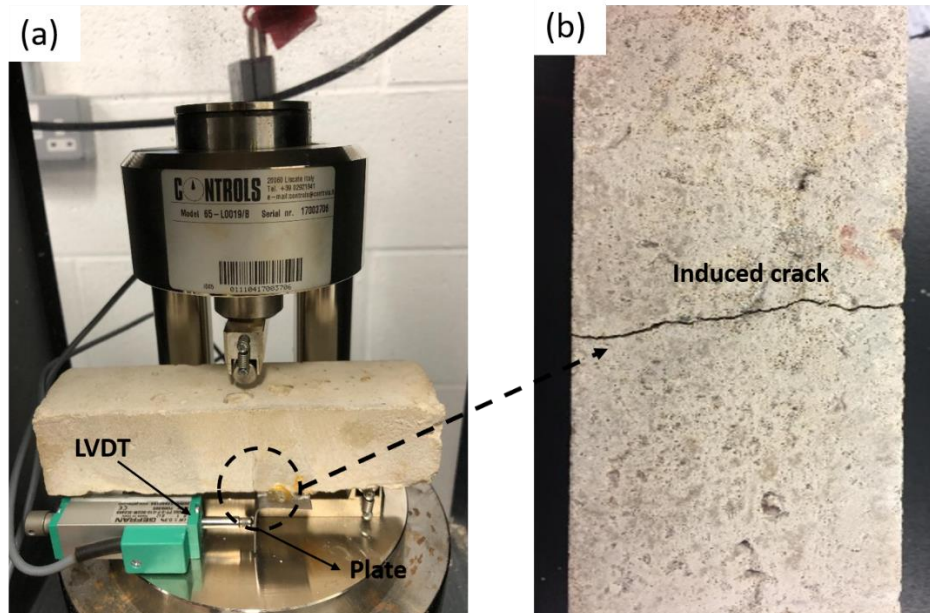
Automatic compression machine used for the three-point load bending test to generate initial cracks (a) Installing a prismatic specimen between the parallel beams (b) The specimen after crack creation
